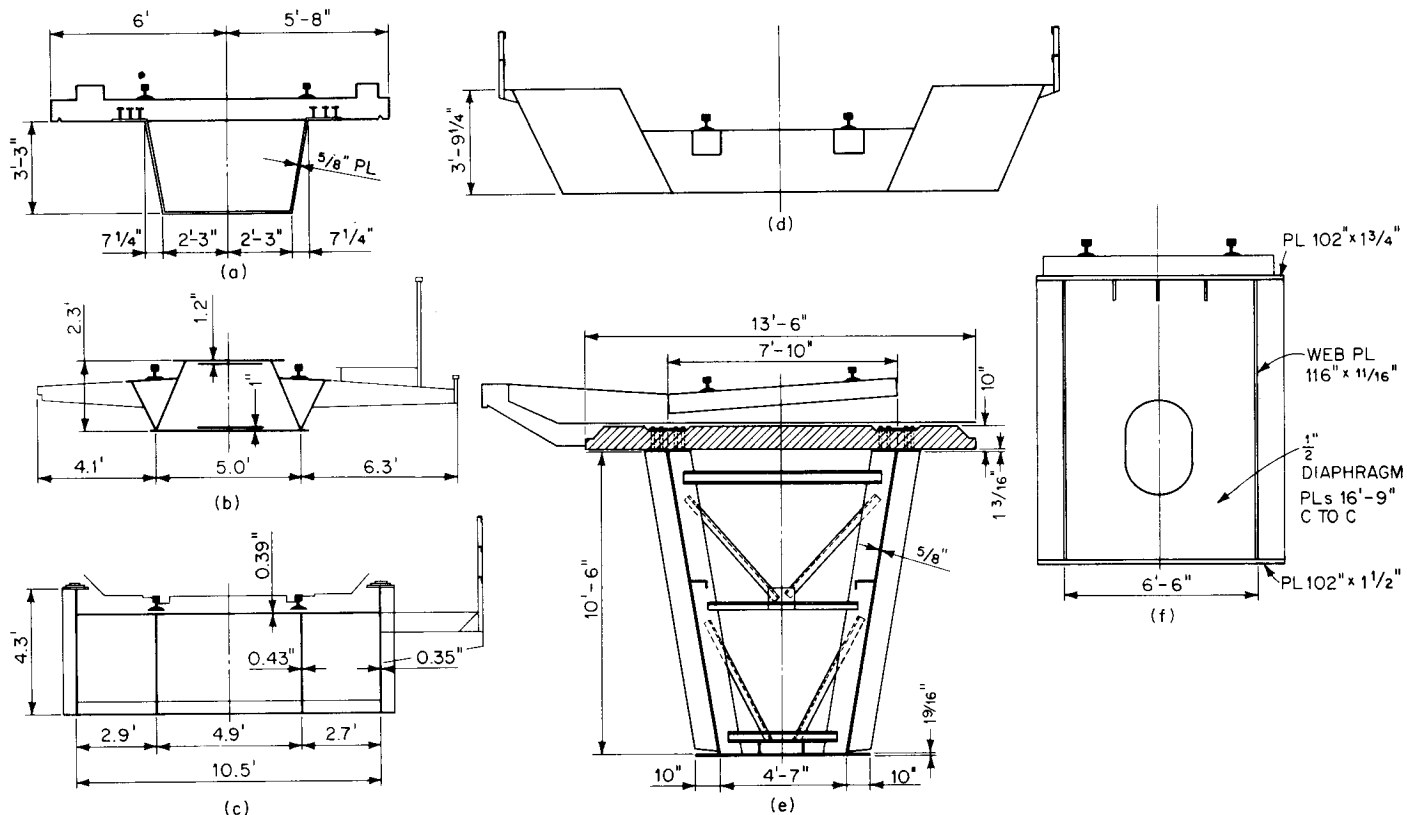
Examples of cross sections of railroad box-girder bridges. (a) Composite girder with 85-ft span for elevated rapid-transit system, San Francisco, Calif. (b) Rails bear directly on steel box of 56-ft span over Autobahn, Kirchweyhe, Bremen, Germany. (c) Three-cell box over Alsstrasse, M-Gladbach, Germany, with 80-ft span. (d) Rigid-frame construction with 117-ft span carries track with radius of 1780 ft, near Frankfurt, Germany. (e) Precast-concrete deck bolted to girder for composite action in 152.5-ft span, Czechoslovakia. (f) Typical section of four 122-ft spans in Chester, Pa.
